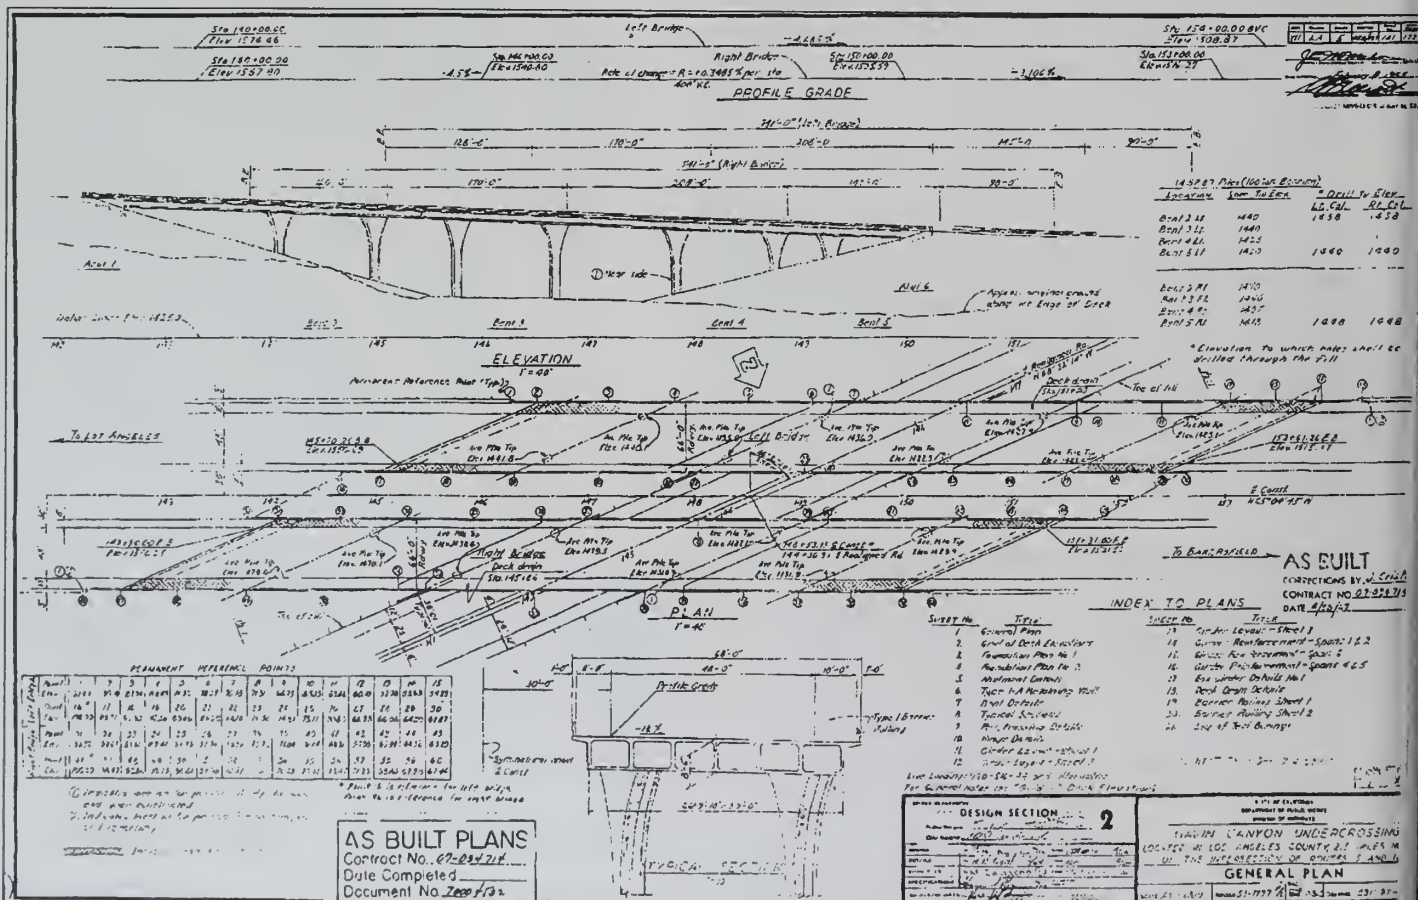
General Plan of Gavin Canyon Undercrossing (53-2790 R/L).
